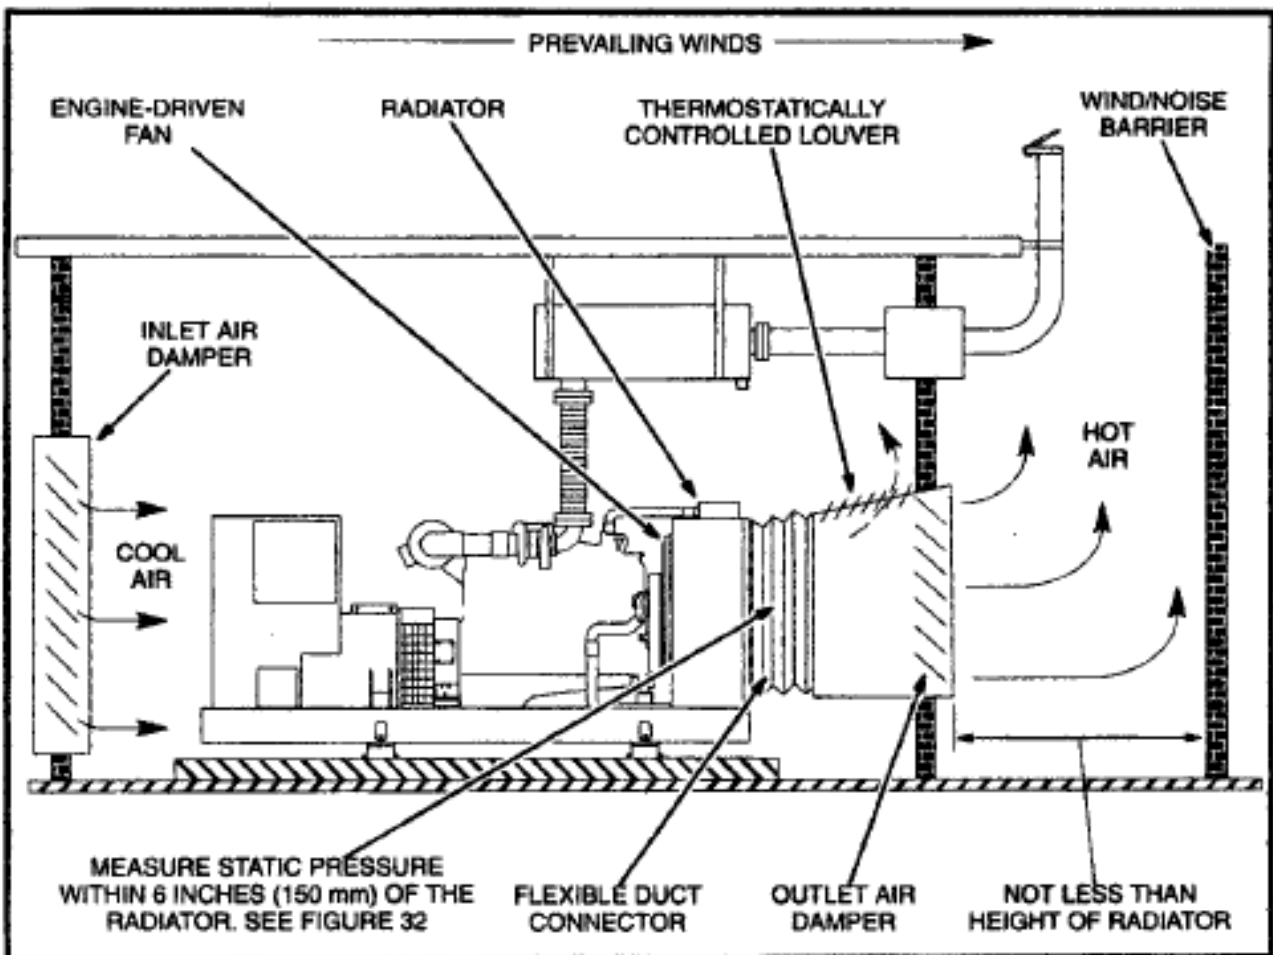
FACTORY-MOUNTED RADIATOR COOLING
